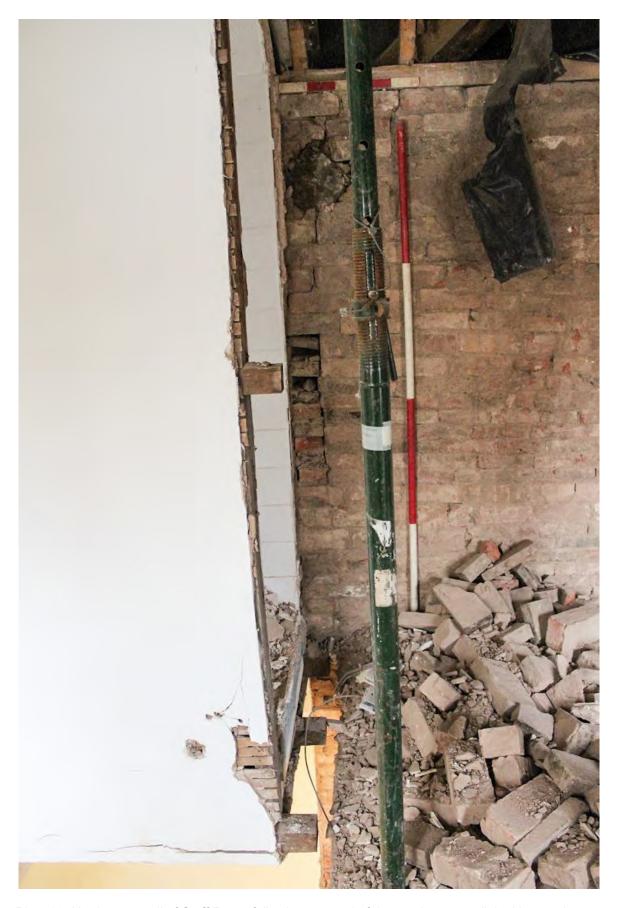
North-west wall of Staff Room following removal of the south-west wall, looking north-west (LMSC16 D103 (32))
